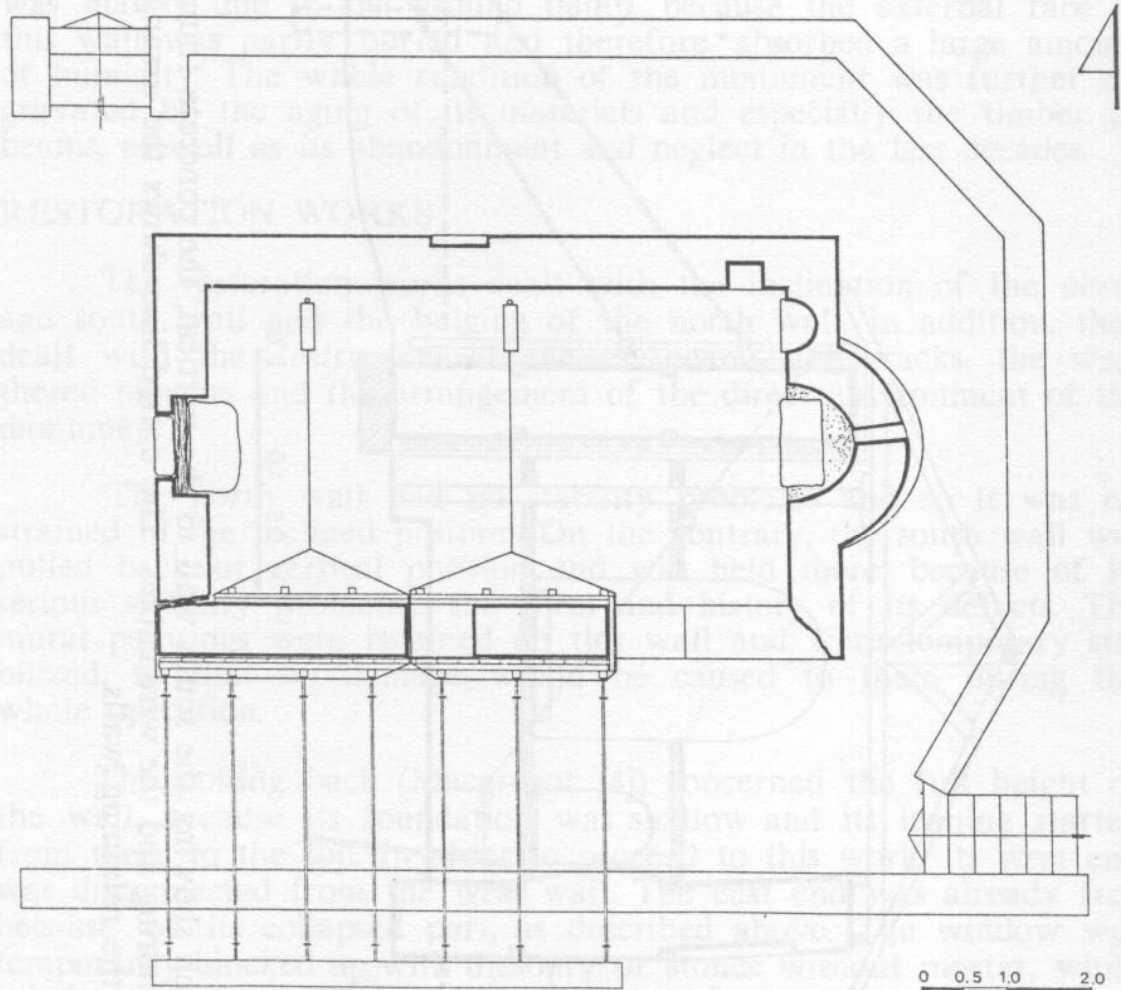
Horizontal plan, showing the position of the wire cables and the raking shoring and also the arrangement of the direct environment.
